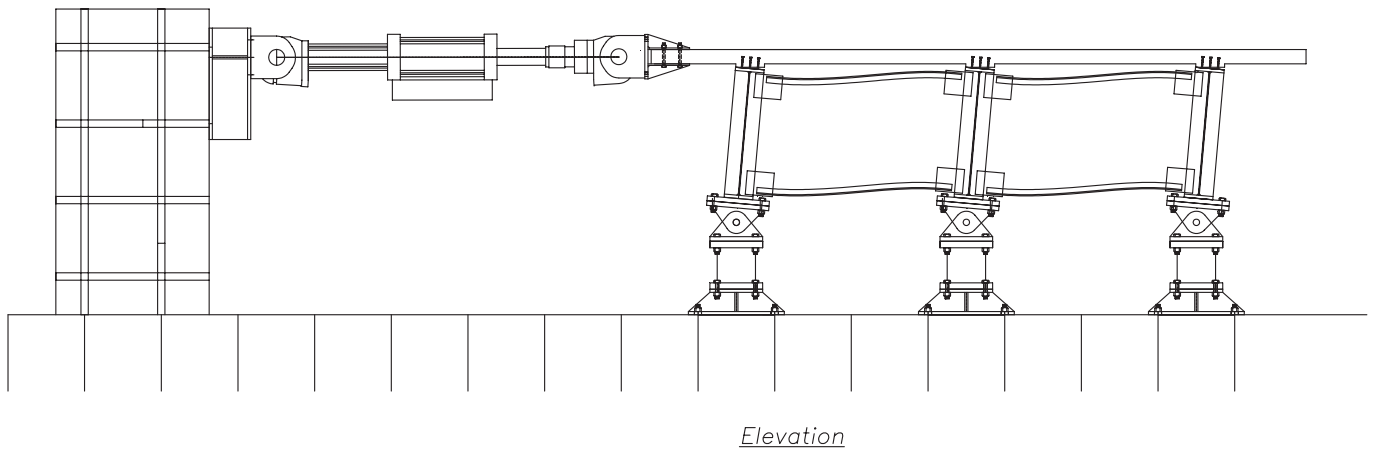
Elevation and dimensions of test setup of specimen FOA.
